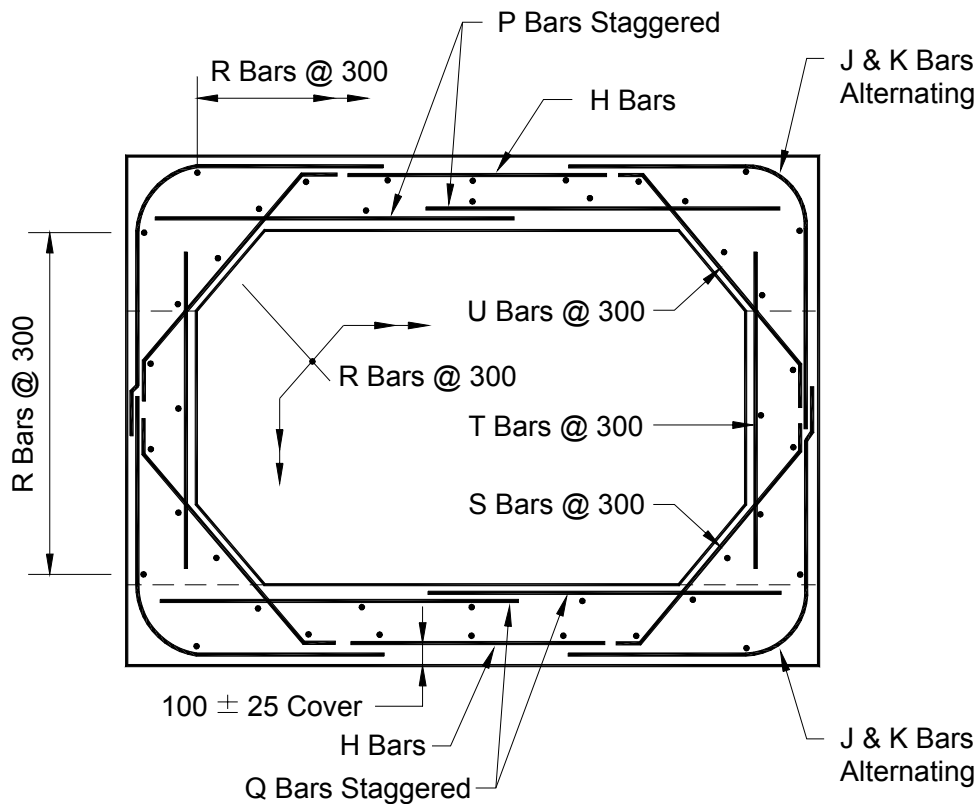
(b) RIGID FRAME BOX CULVERT REINFORCEMENT
